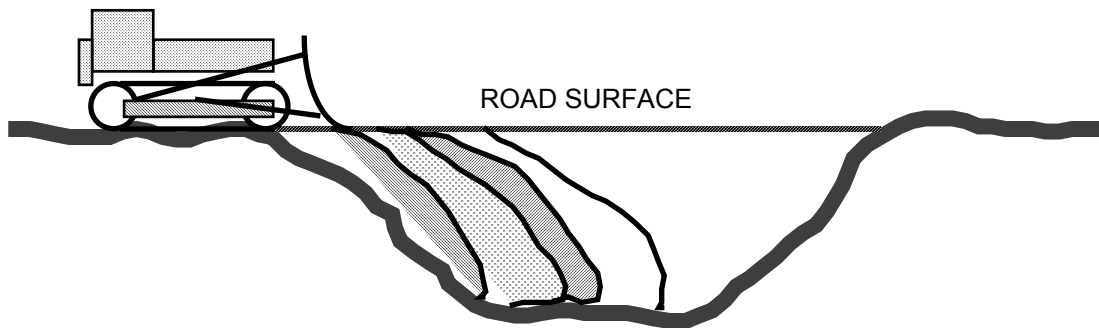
Fills that are part of the roadway should not be constructed by end dumping. (from OSU Ext. Service, 1983).
